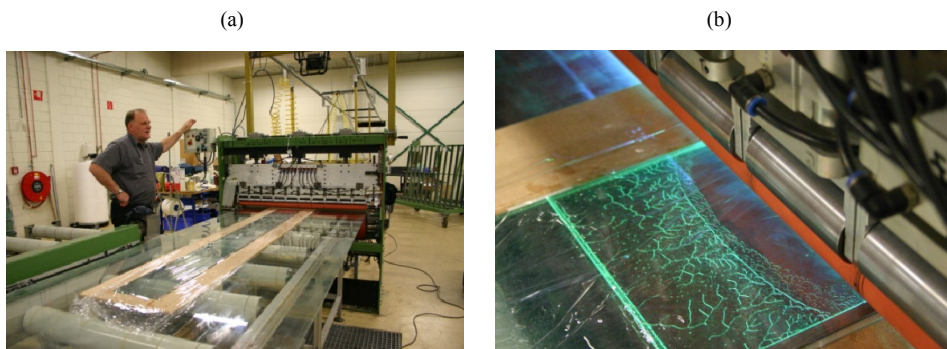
Semi-automated adhesive bonding process; (a) Overview of the process with un-cured reinforced glass beam assembled in a wooden mold; (b) A compression roller mechanism drives the air out of the un-cured adhesive between the glass layers.
